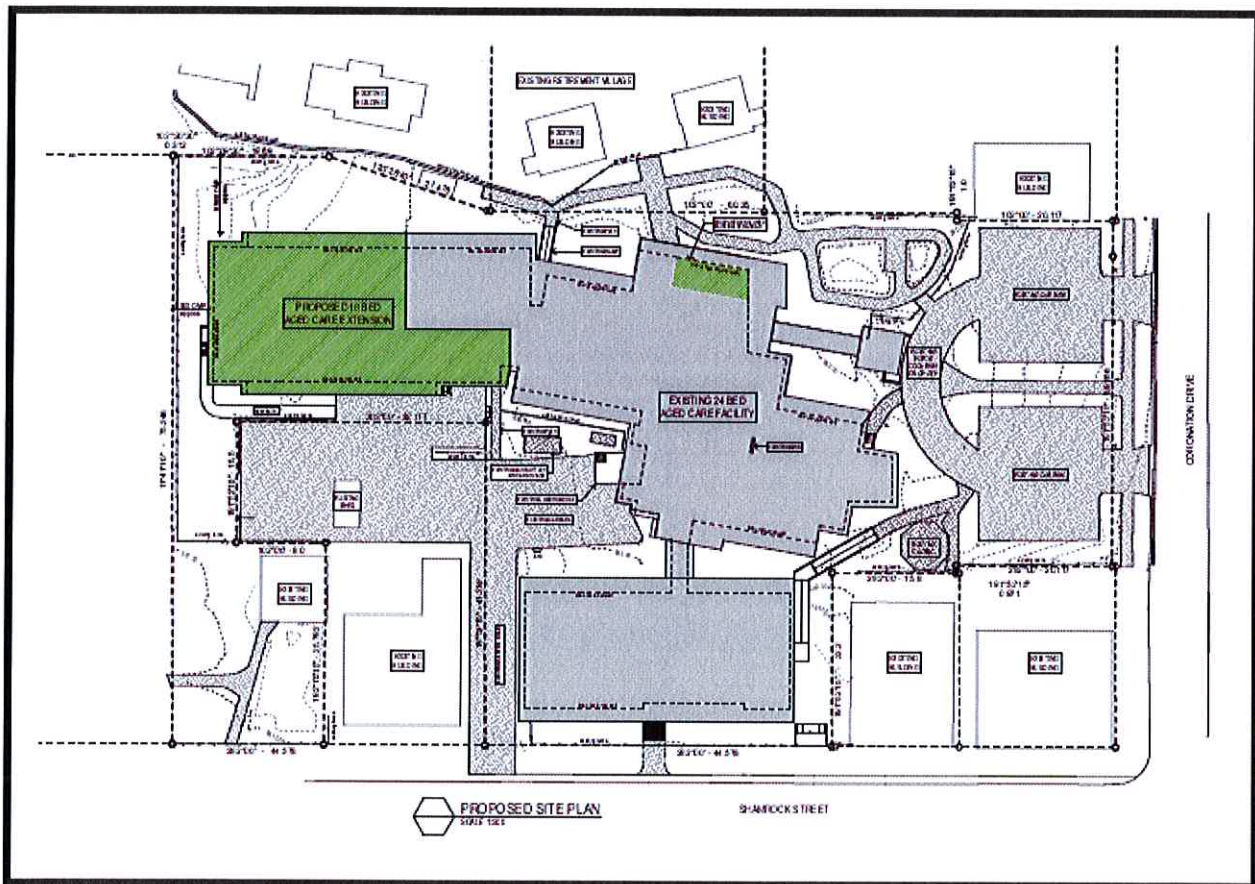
PROPOSED SITE PLAN (Source: Extract from approved plans)
